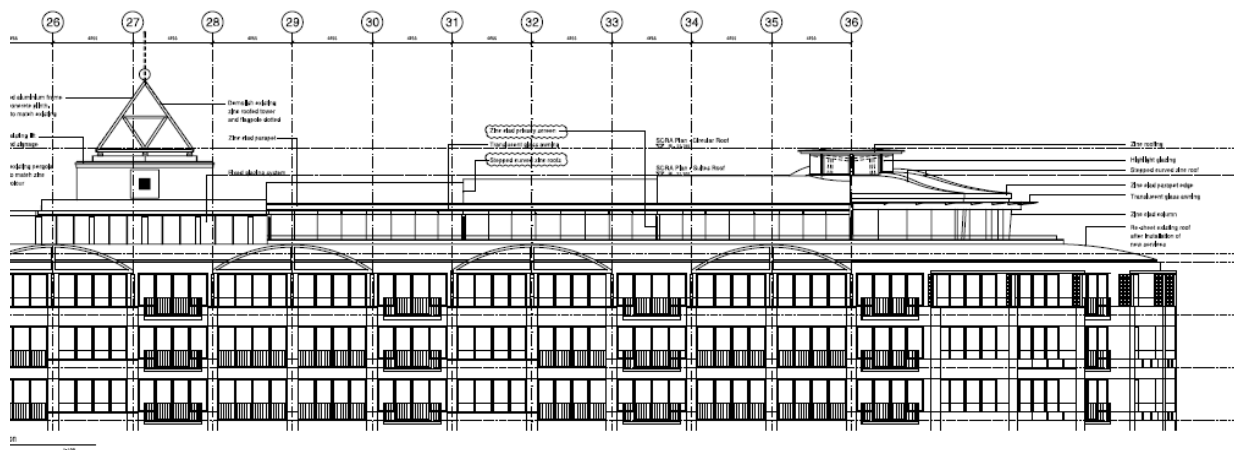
Sydney Cove Redevelopment Authority Building Site Control Drawing XXV-B(3)- 14 November 2005.
